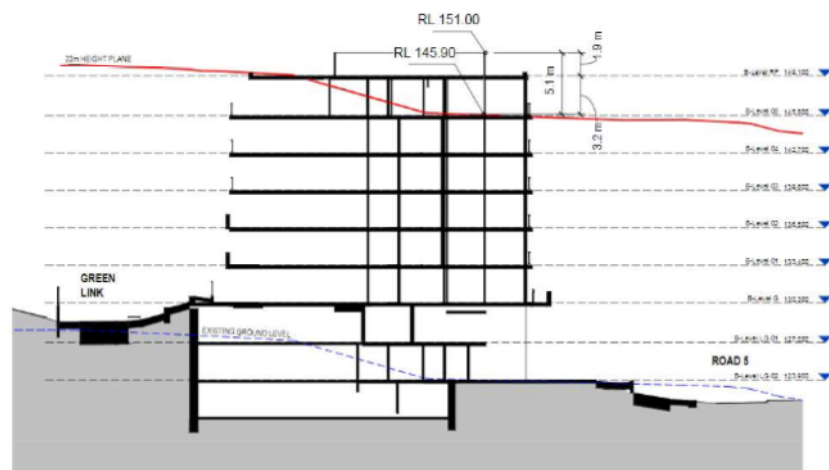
South Section of Building B showing the extent of height contravention (5.1m) (Source: Mirvac Design)
